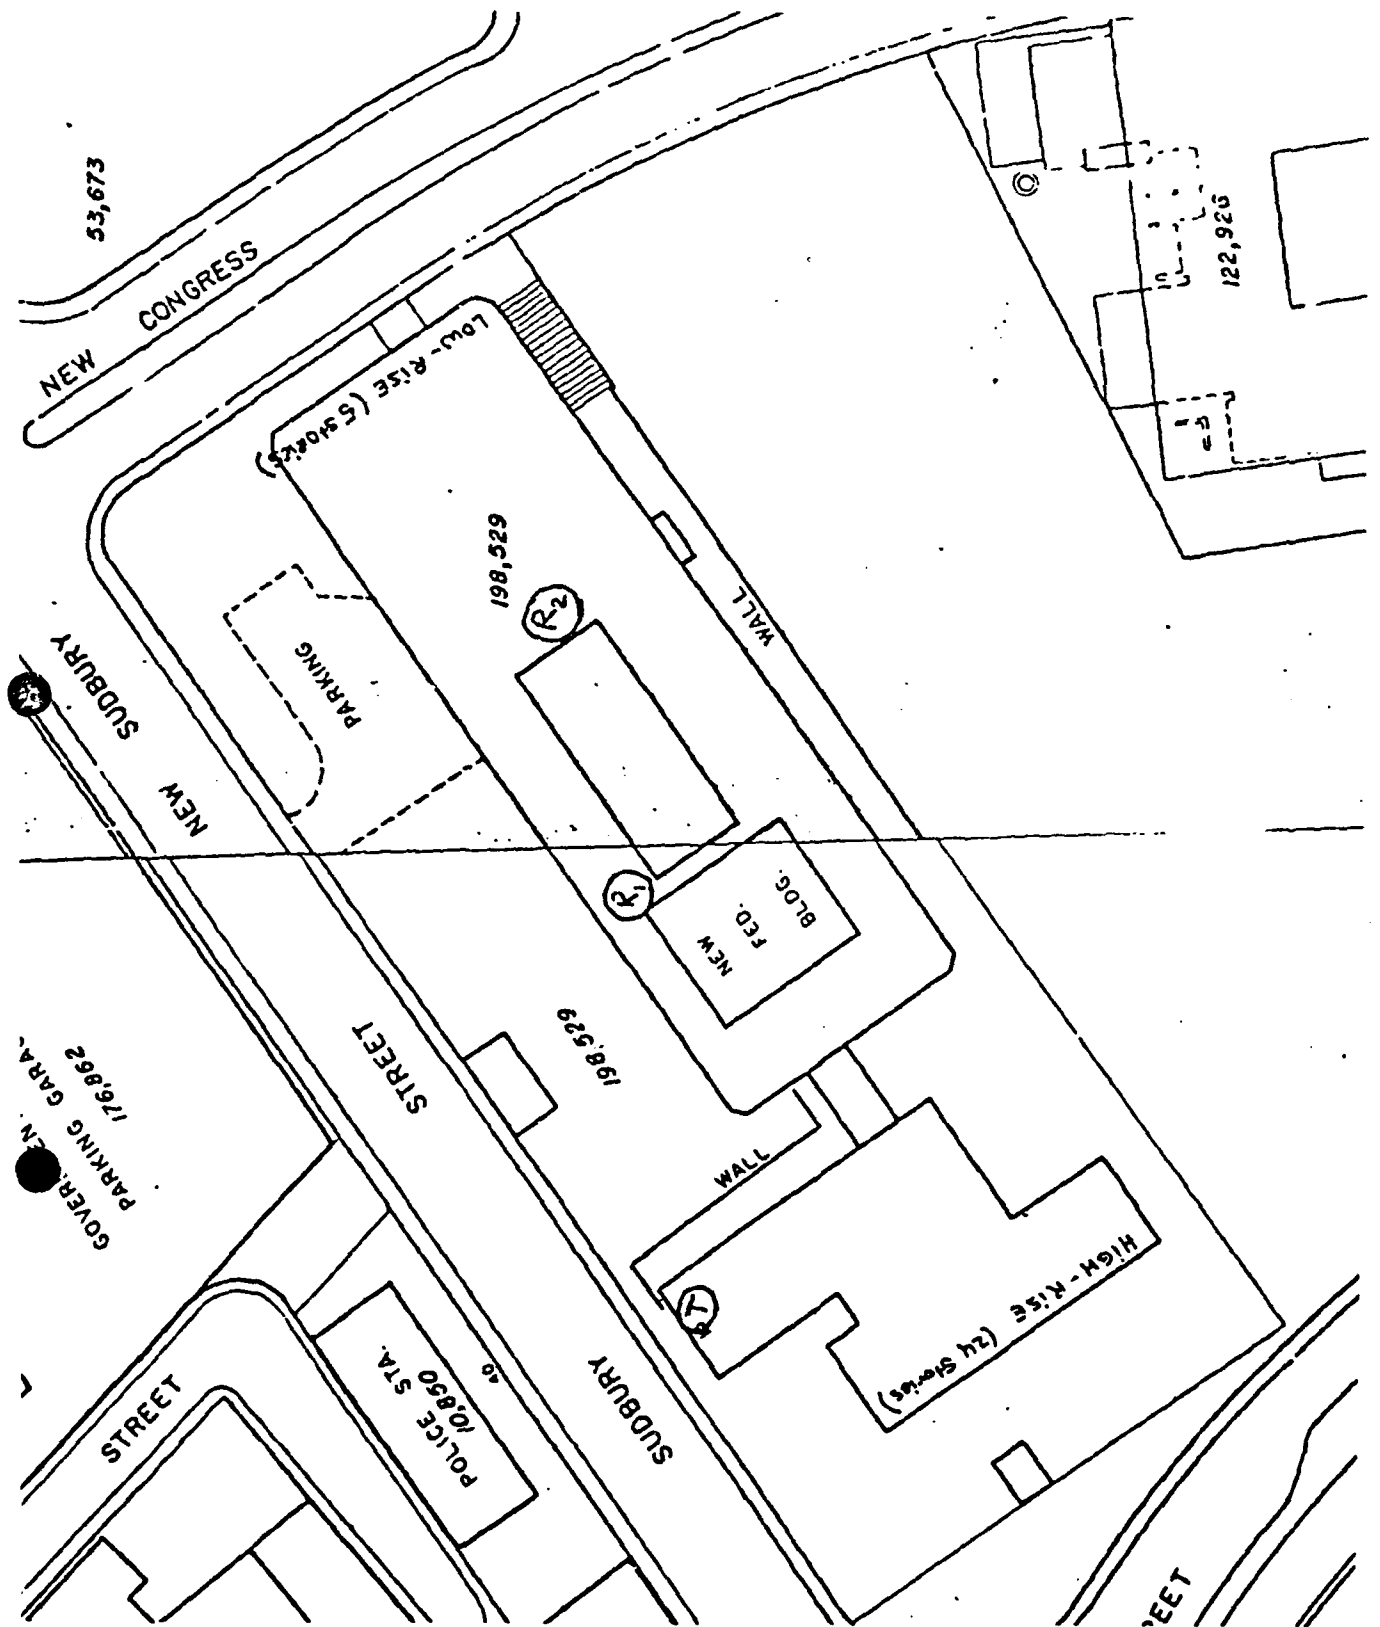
Floor Map of Two Adjoining Concrete Office Buildings
